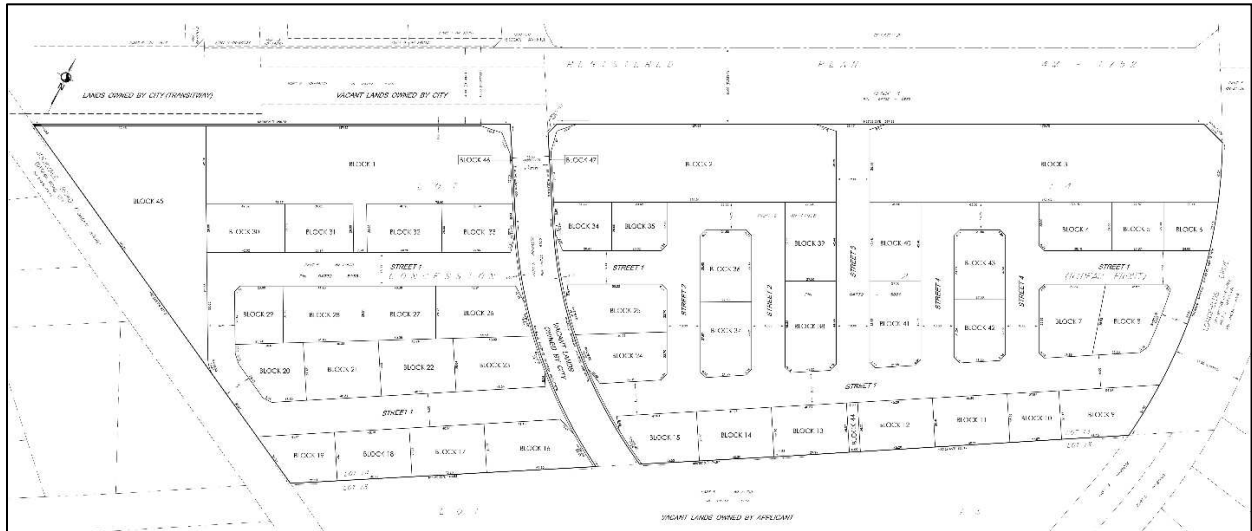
Excerpt from the Draft Plan of Subdivision prepared by Stantec dated February 19, 2026.
